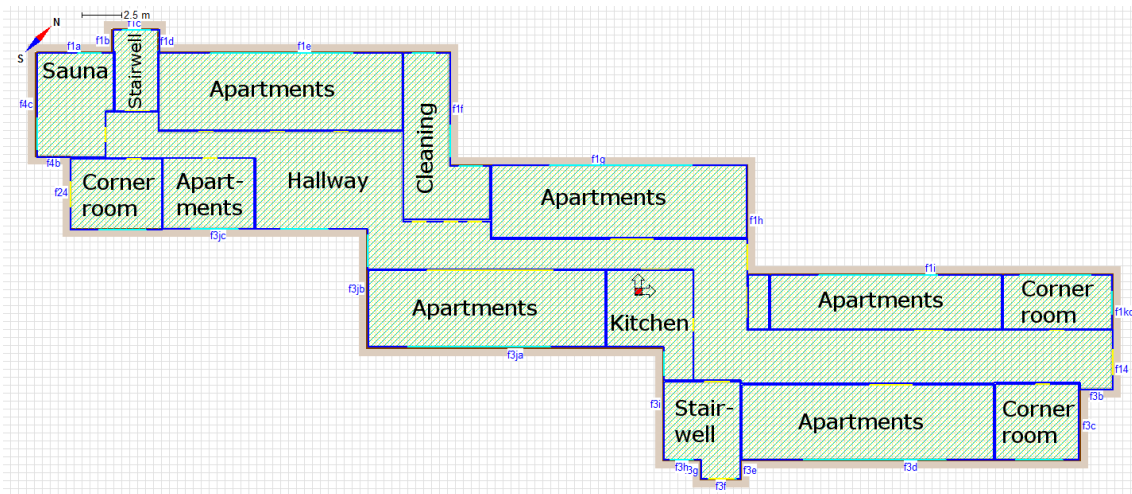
Floor plan of Jukola modified IDA ICE building model, with simplified zone division, levels 1–4. Level 5 is very similar to levels 1–4. WC and shower spaces are situated in the apartments.
